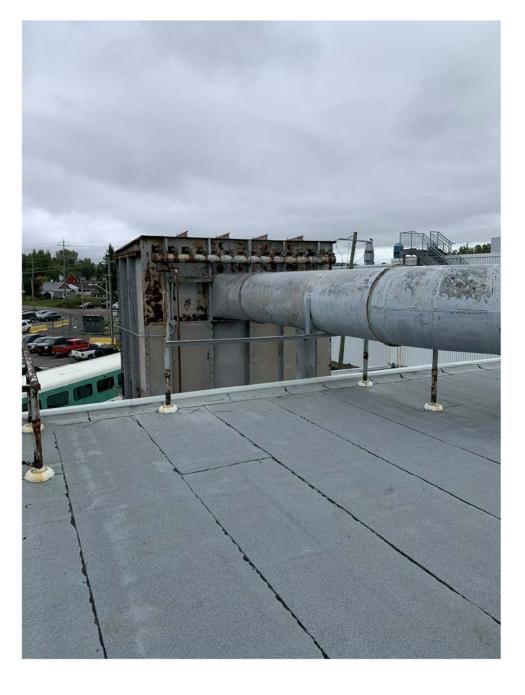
PHOTO E - EXISTING DUST COLLECTOR (HIGH LEVEL).
